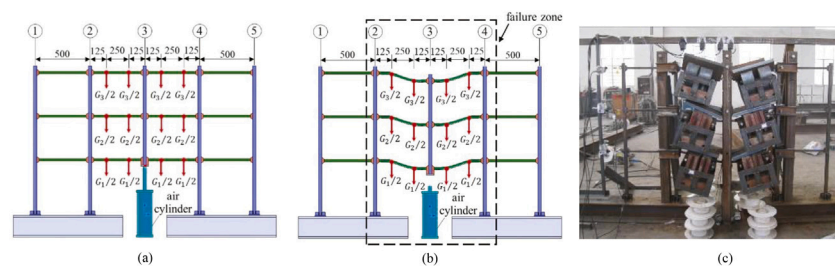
Dynamic column removal process with a pneumatic device; (a) schematic view of the initial condition, (b) schematic view after column removal and (c) specimen's deformed shape after the experiment, as reported in [66].
